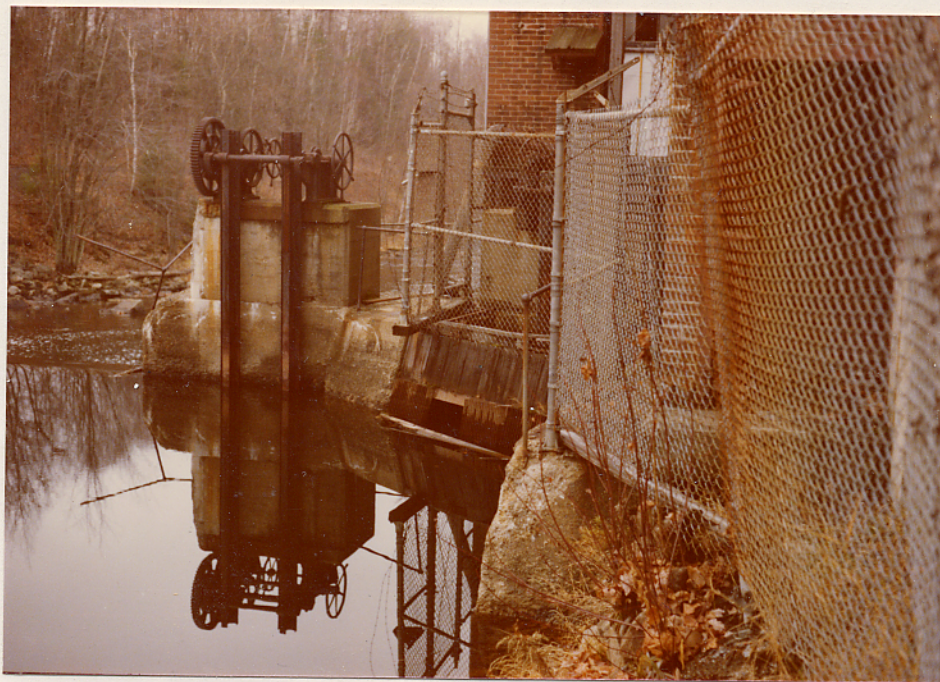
Looking at inlet to penstock and control to drain gate located on north abutment.
